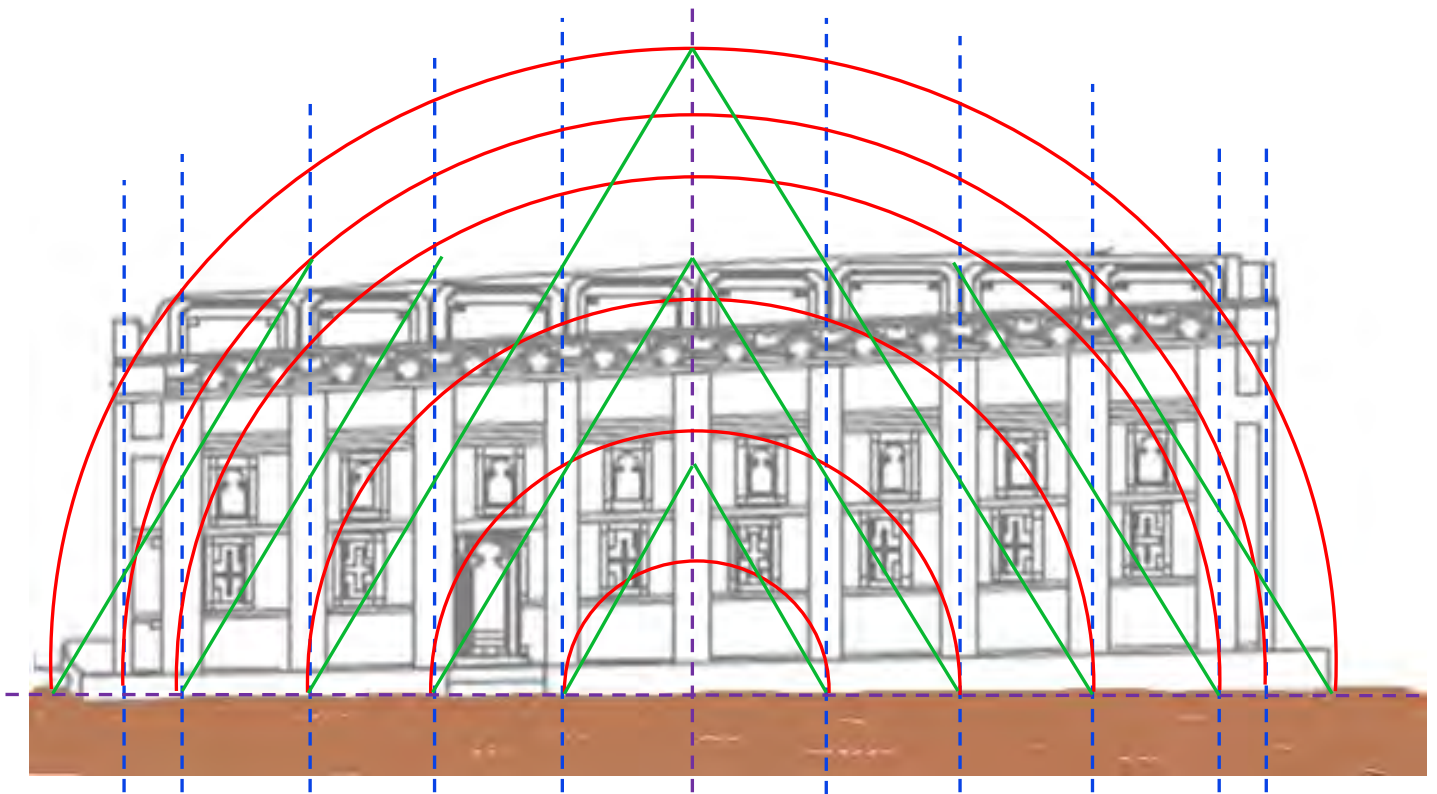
The Front Elevation Plan of Bete Medhanealem and under the geometrical configuration of consecutive golden proportioned of circles
